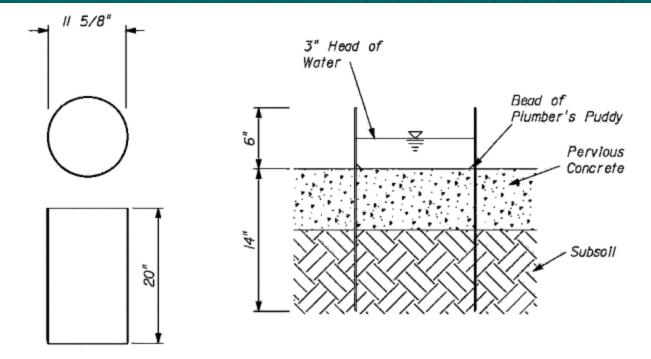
Single-ring infiltrometer (1 in. = 25.4 mm).
